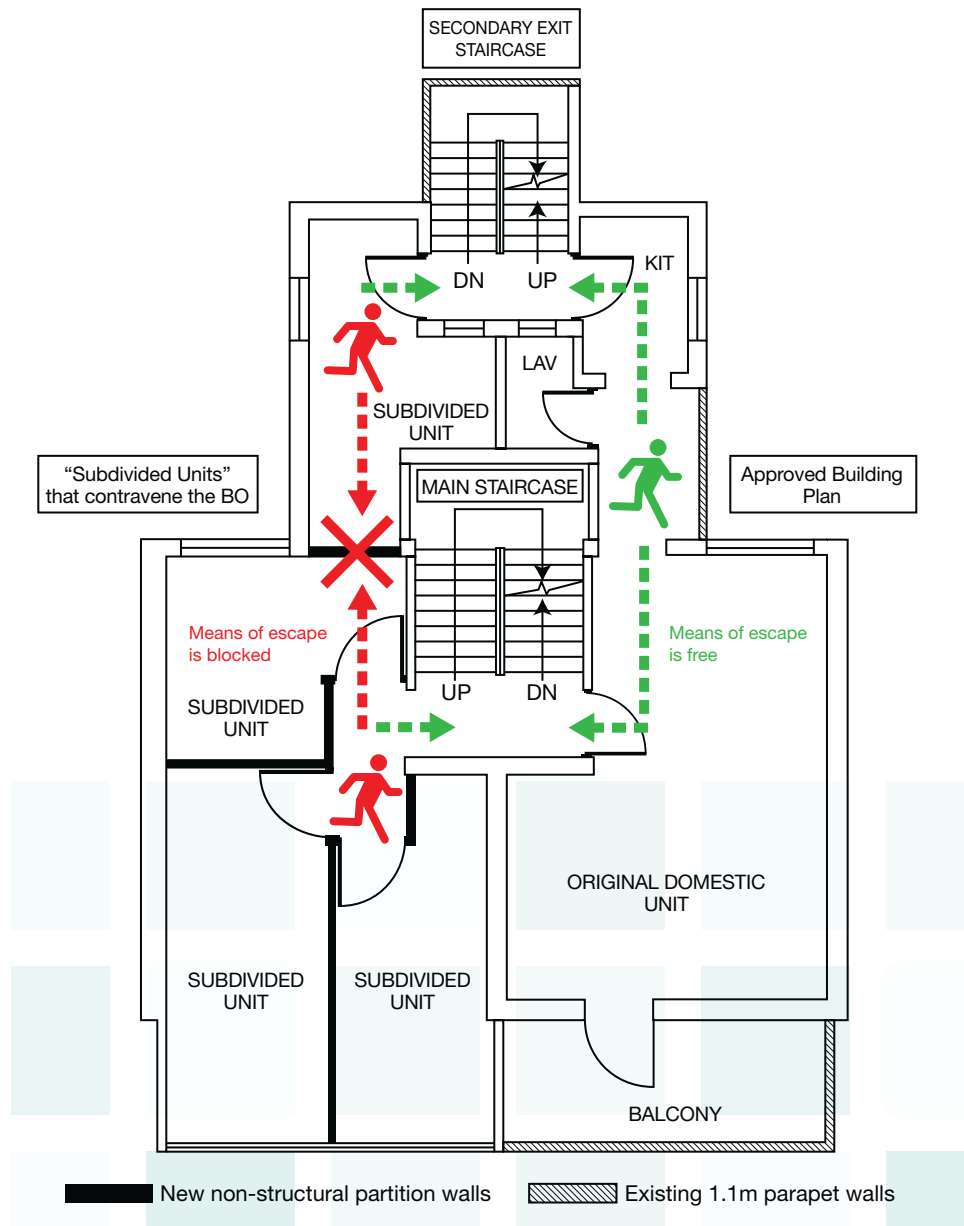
“Subdivided unit” obstructing the means of escape leading to the secondary exit staircase
